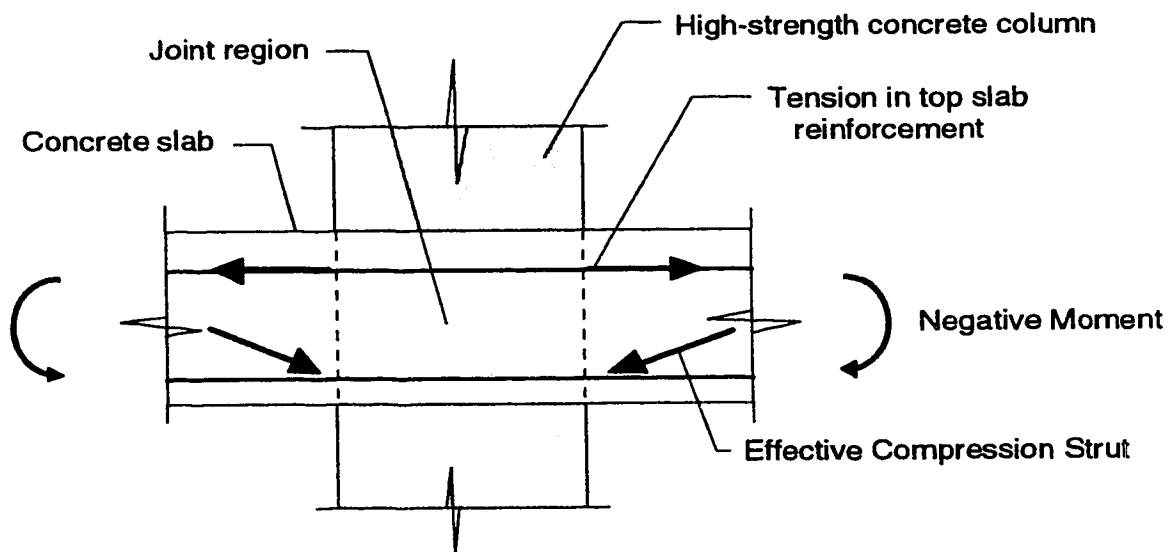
Stresses at joint region (specimens with loaded slabs)
